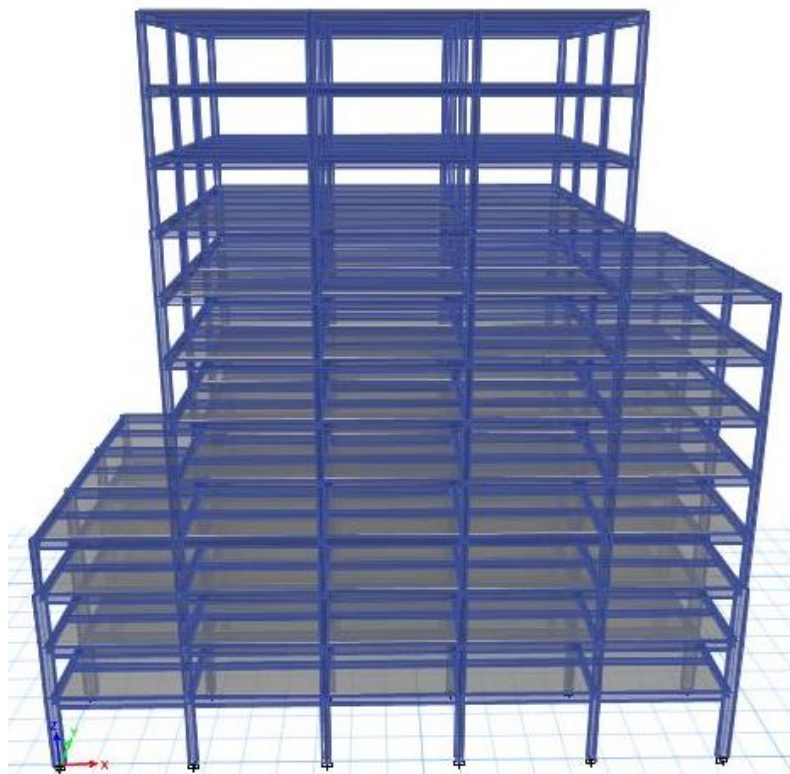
3D view of (1Rx1L) D E 12 story elevation
